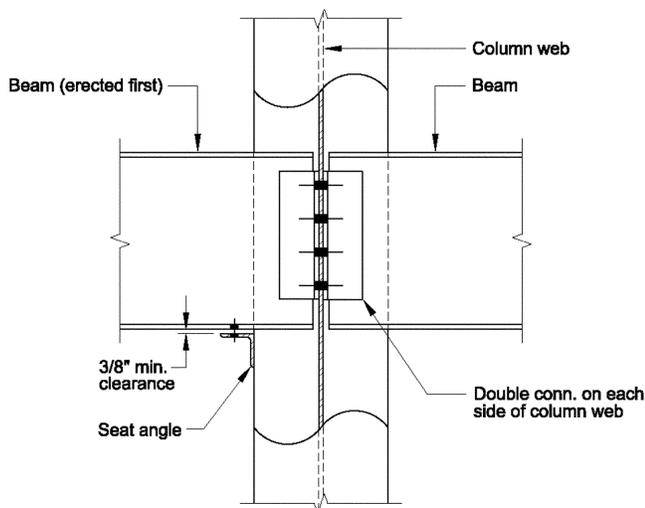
Double connection with shop-welded erection seat.
